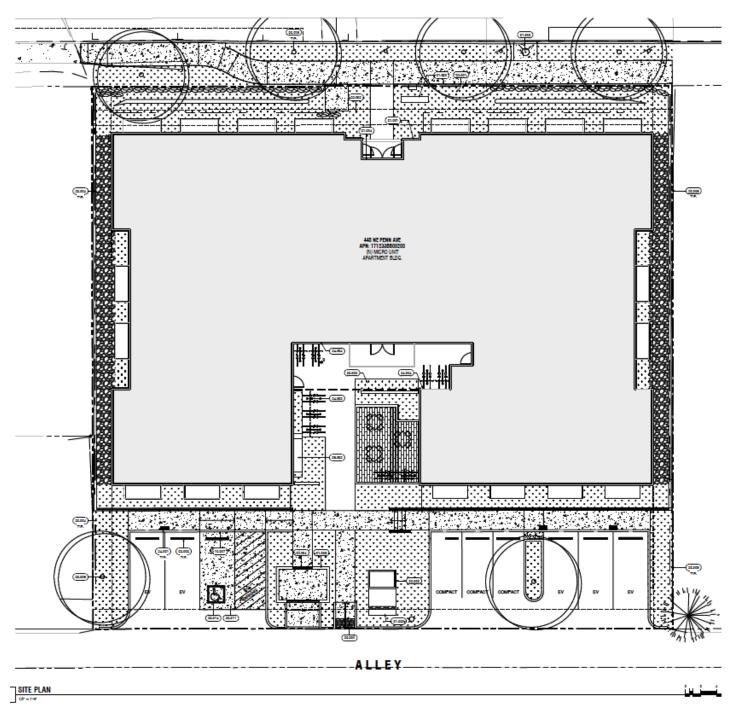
EV Ready Parking Space Locations as indicated on Site Plan (5 EV spaces are designated on Site Plan)
